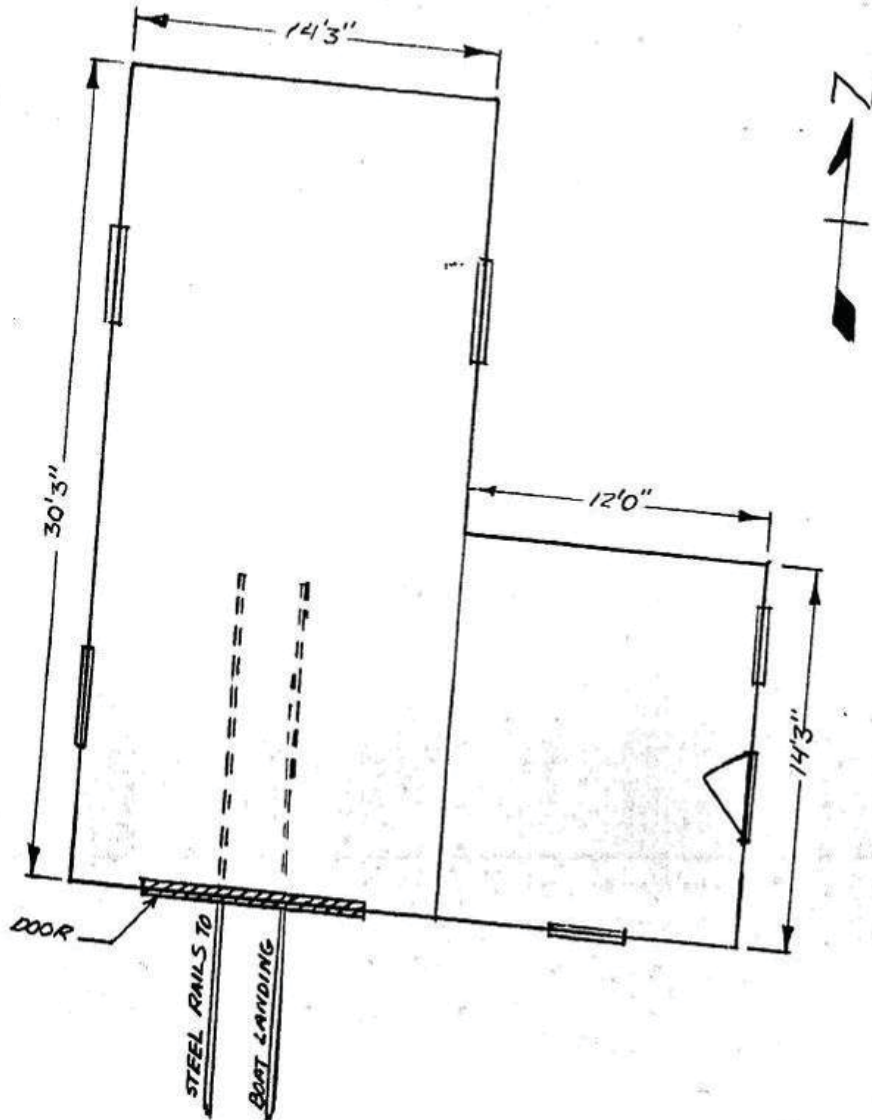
74: Floor plan of USFS Boathouse at Chik-Wauk (source: USFS)
